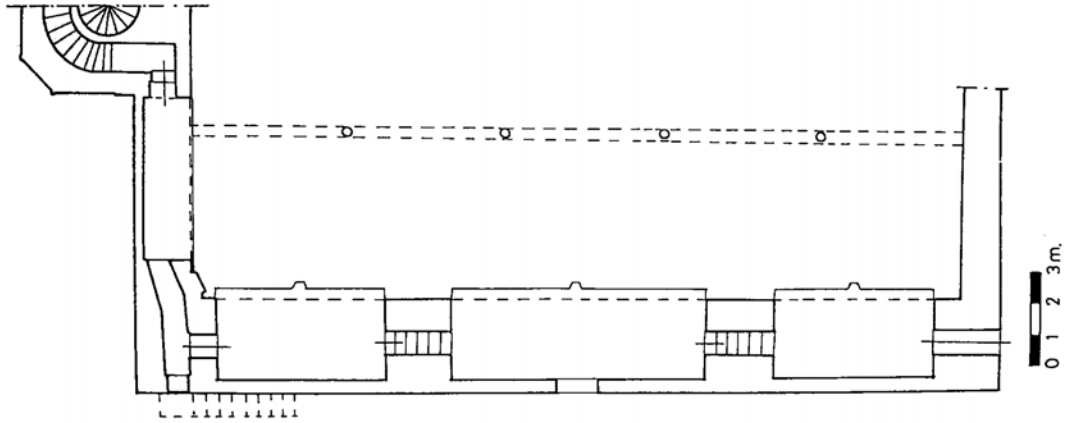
Sungur Bey Mosque- Plan of the Mahfil Section (Özkarıcı 2001, Drawing 24)
